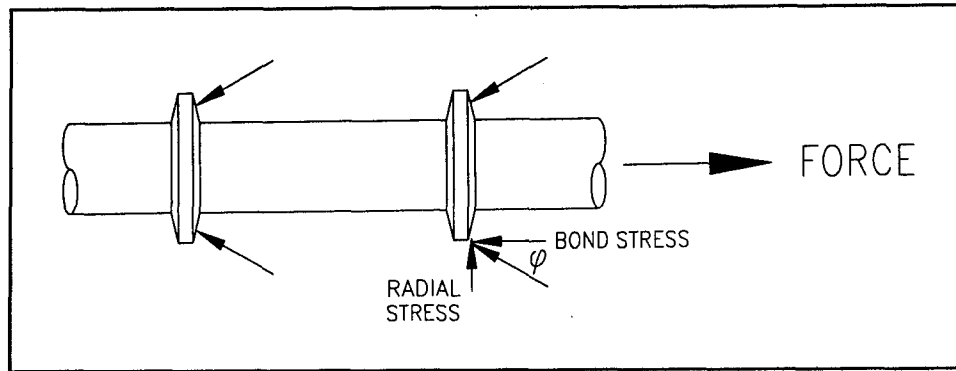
Bond and radial stresses developed by bearing of reinforcement deformations against grout
